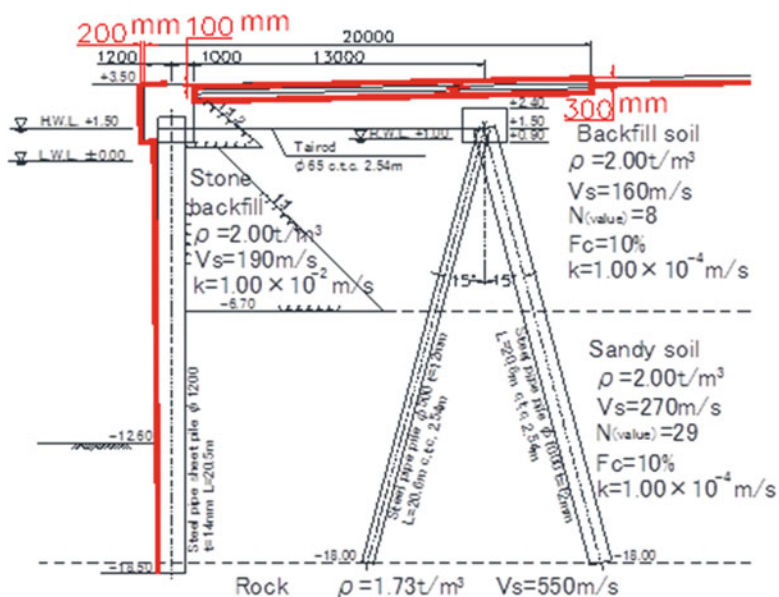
Damage to a sheet pile quay wall subject to earthquake motion of extremely long duration (2011 East Japan Earthquake ($M = 9.0$), Soma Port, No.2 Wharf (-12 m))
